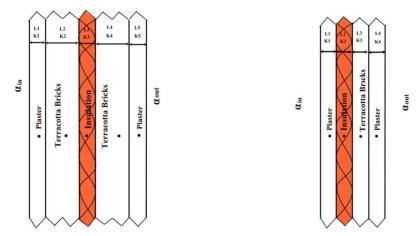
A wall with Insulation Using Terracotta Bricks Material Construction.
